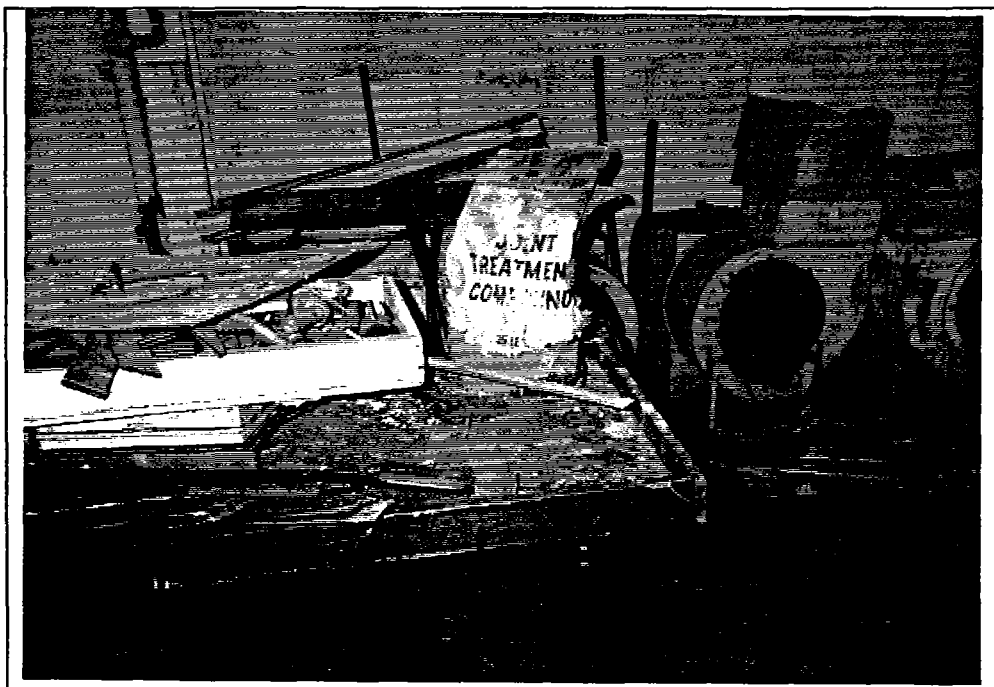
Building 30A - Bag of non-asbestos joint compound sampled in Sample No. 1-041.
